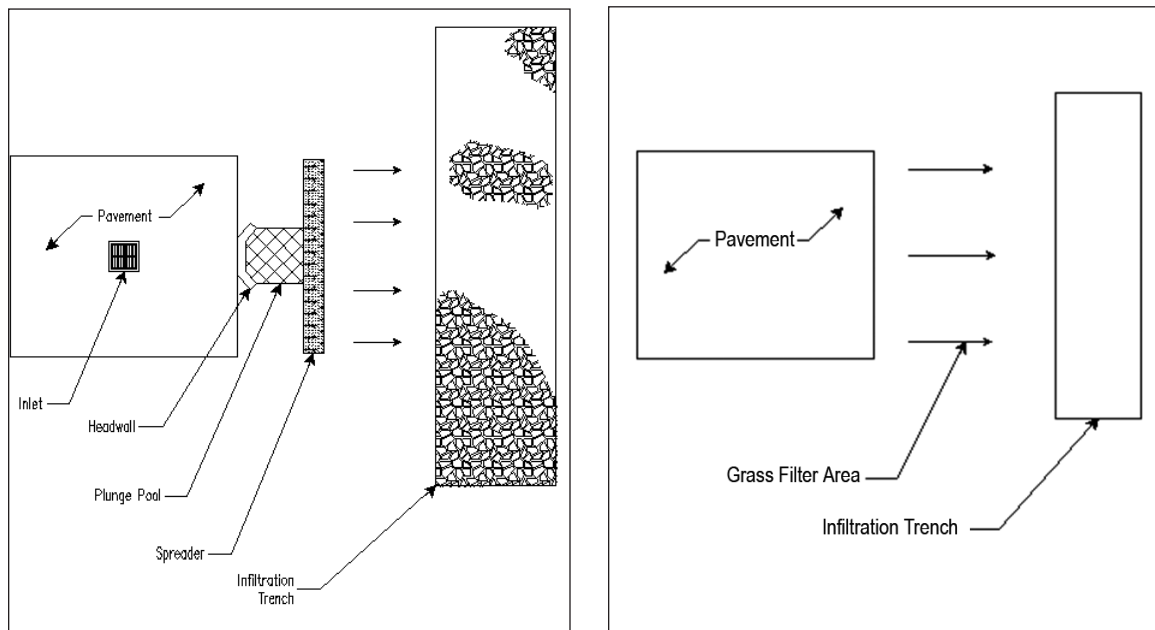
Typical Infiltration Trench with Plunge Pool
